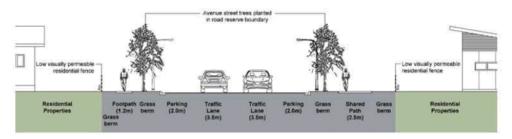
F: Cross section of Collector and Secondary Collector Roads in the General Residential Zone
